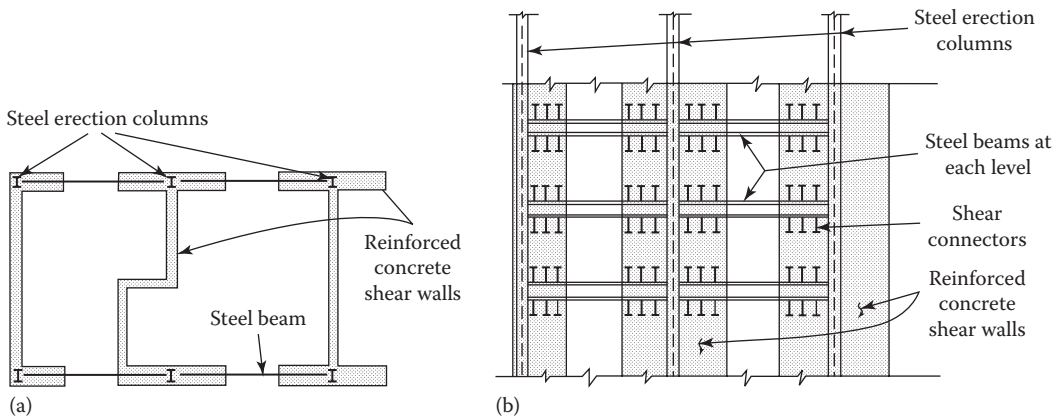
Composite shear wall with steel link beams: (a) plan; (b) elevation.
